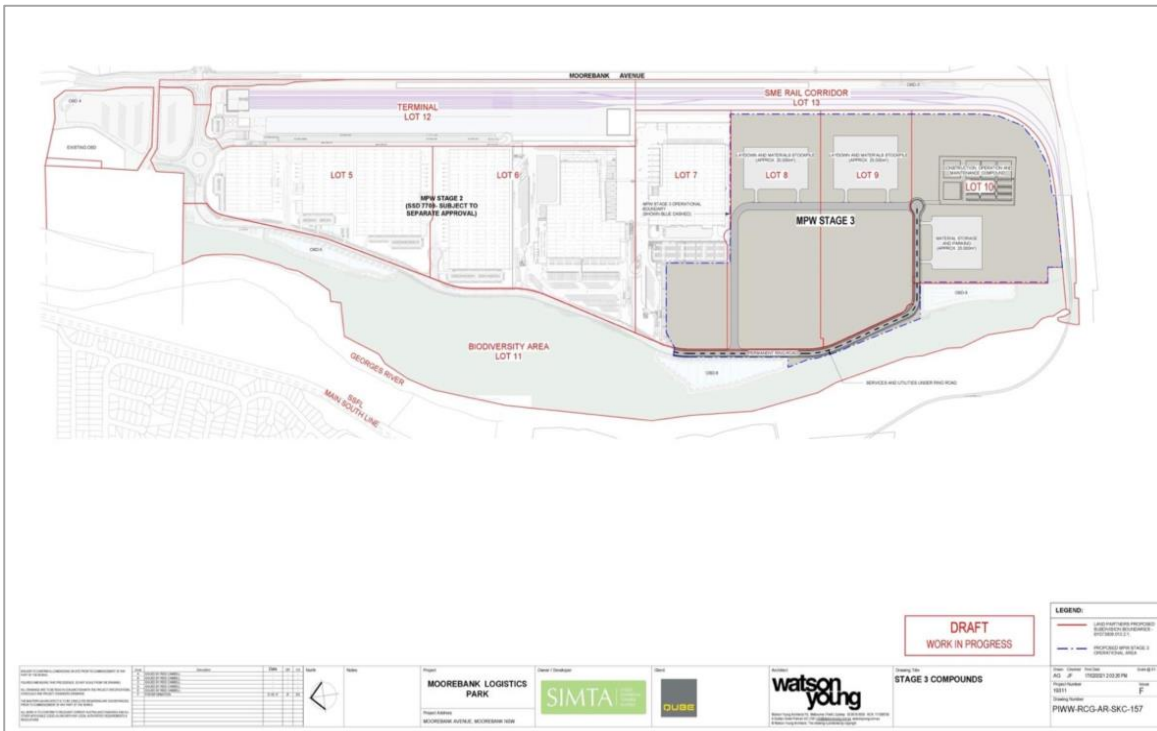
MPW3 Site Layout (Source: MPW S2 S3 CEMP, Rev Q, SIMTA 2 December 2021)
